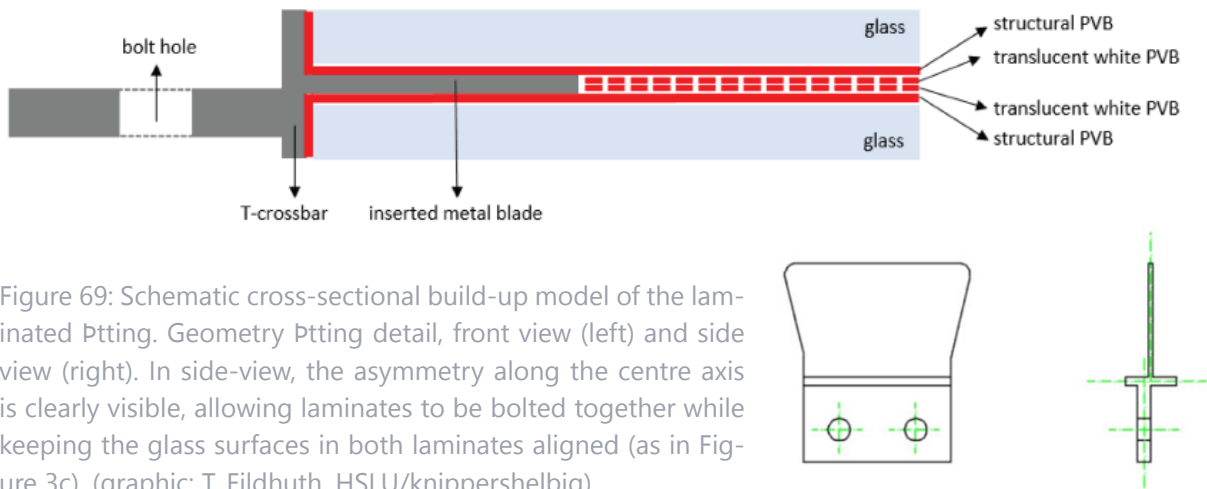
Schematic cross-sectional build-up model of the laminated Ptting. Geometry Ptting detail, front view (left) and side view (right). In side-view, the asymmetry along the centre axis is clearly visible, allowing laminates to be bolted together while keeping the glass surfaces in both laminates aligned (as in Figure 3c). (graphic: T. Fildhuth, HSLU/knippershelbig)
